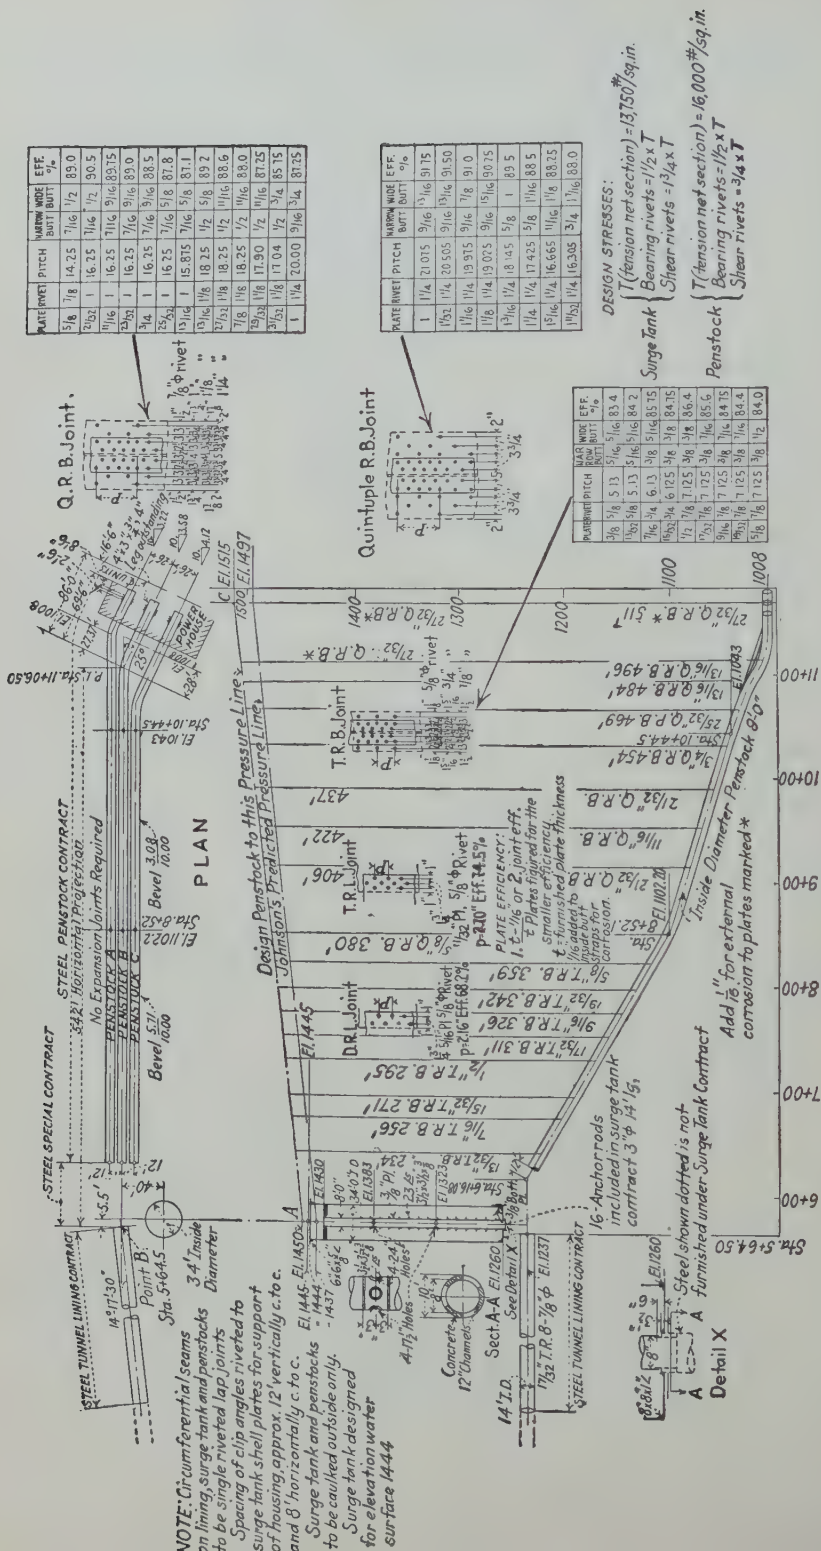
Penstock and surge tank layout, Davis Bridge development—New England Power Company.
